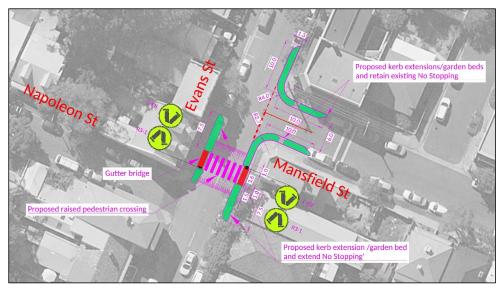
Evans Street / Mansfield Street T-intersection proposal.
